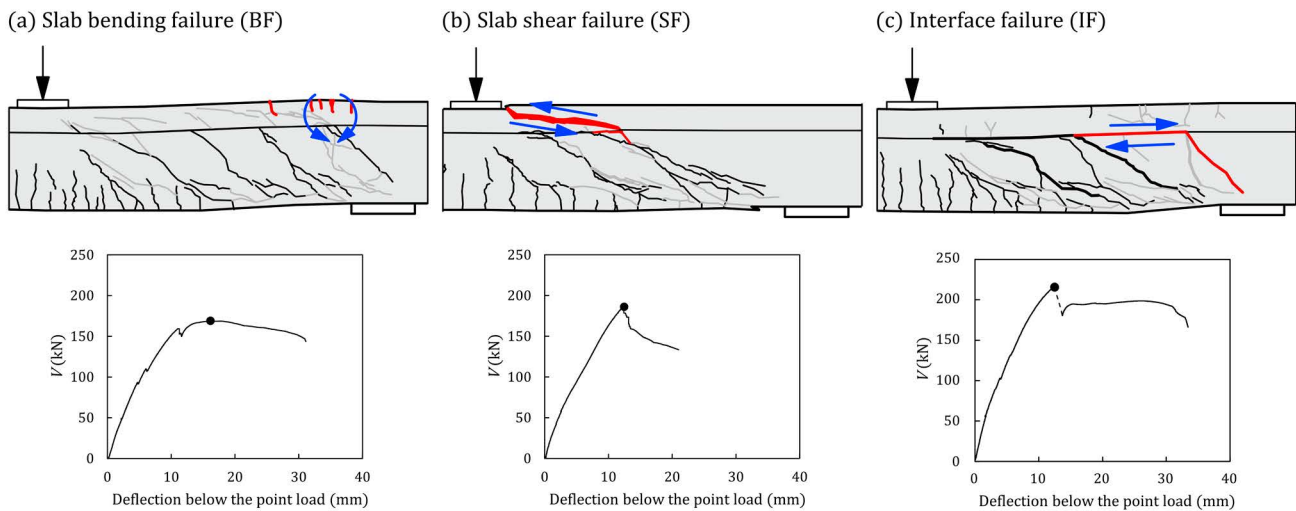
Representative examples of the three failure modes and their shear-deflection curves: (a) Slab bending failure (BF) (specimen NWP3B2); (b) Slab shear failure (SF) (specimen HWP6B2); (c) Interface failure (IF) (specimen NWP2B2).
